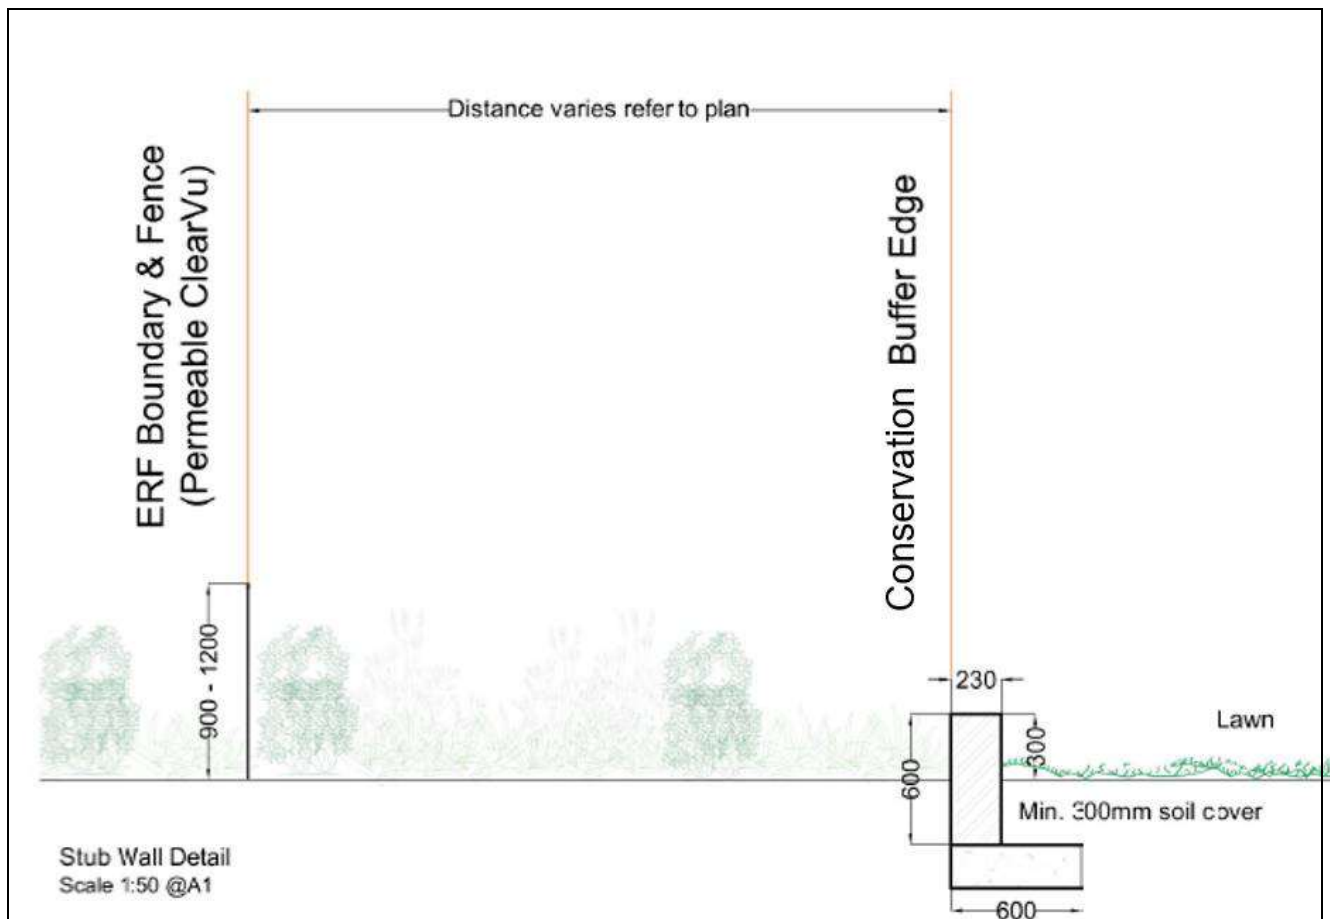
Schematic design of the proposed stub wall, as provided by Viridian Consulting (2021)
